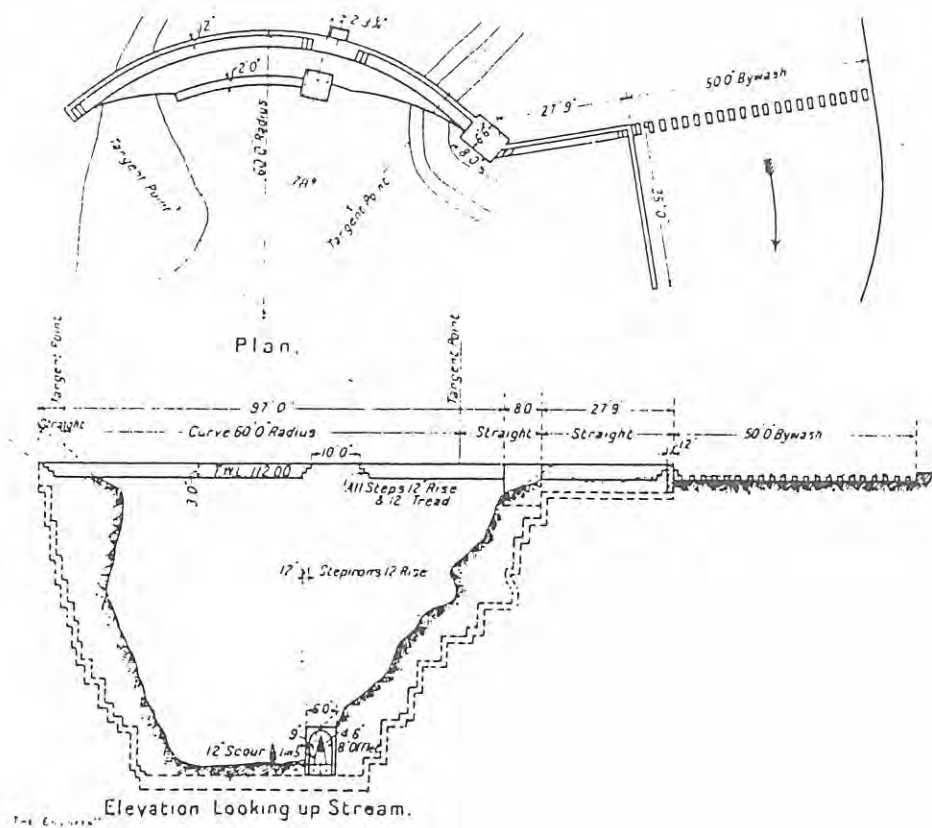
THE MEDLOW DAM PLAN AND ELEVATION
